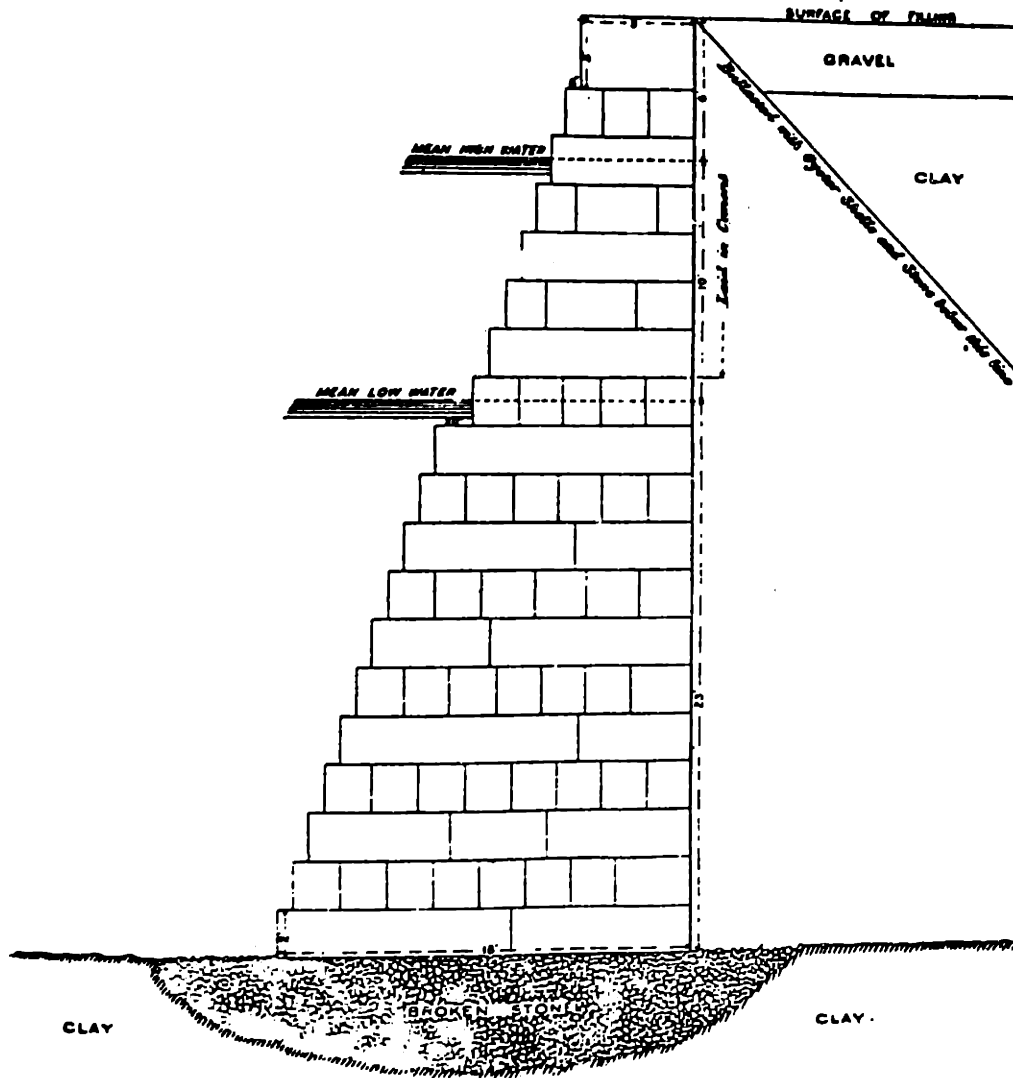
Prefill Cross-section of South Boston Flats (Parrott, George B., 1849)
